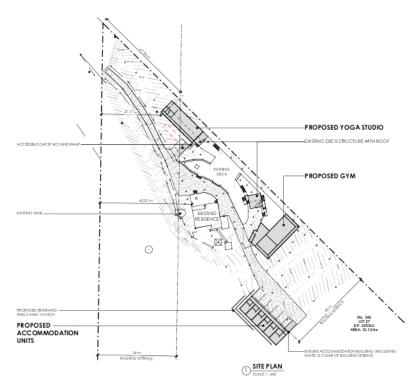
LAYOUT (SUNRAI DESIGNS)
